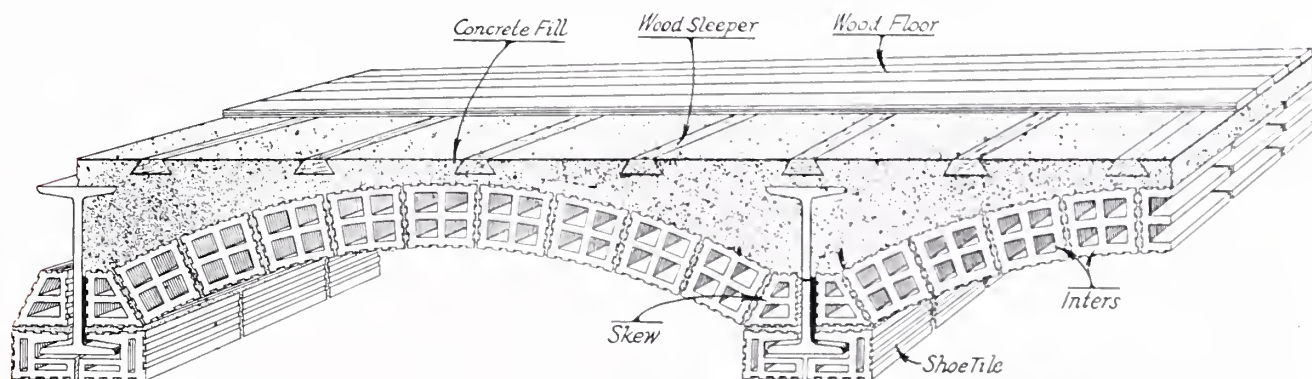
Section of Segmental Arch Floor, illustrating method of protecting exposed portions of girder, making concrete fill and placing sleepers for finished wood floor.
